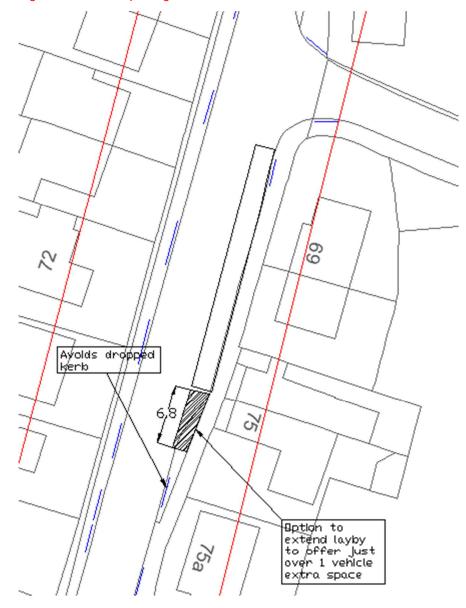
shows the potential for an additional space to be located outside properties 69-75a. The additional space could be delivered by extending the parking bay by circa 6-7m south of the existing boundary. This could accommodate an additional vehicle off street.
